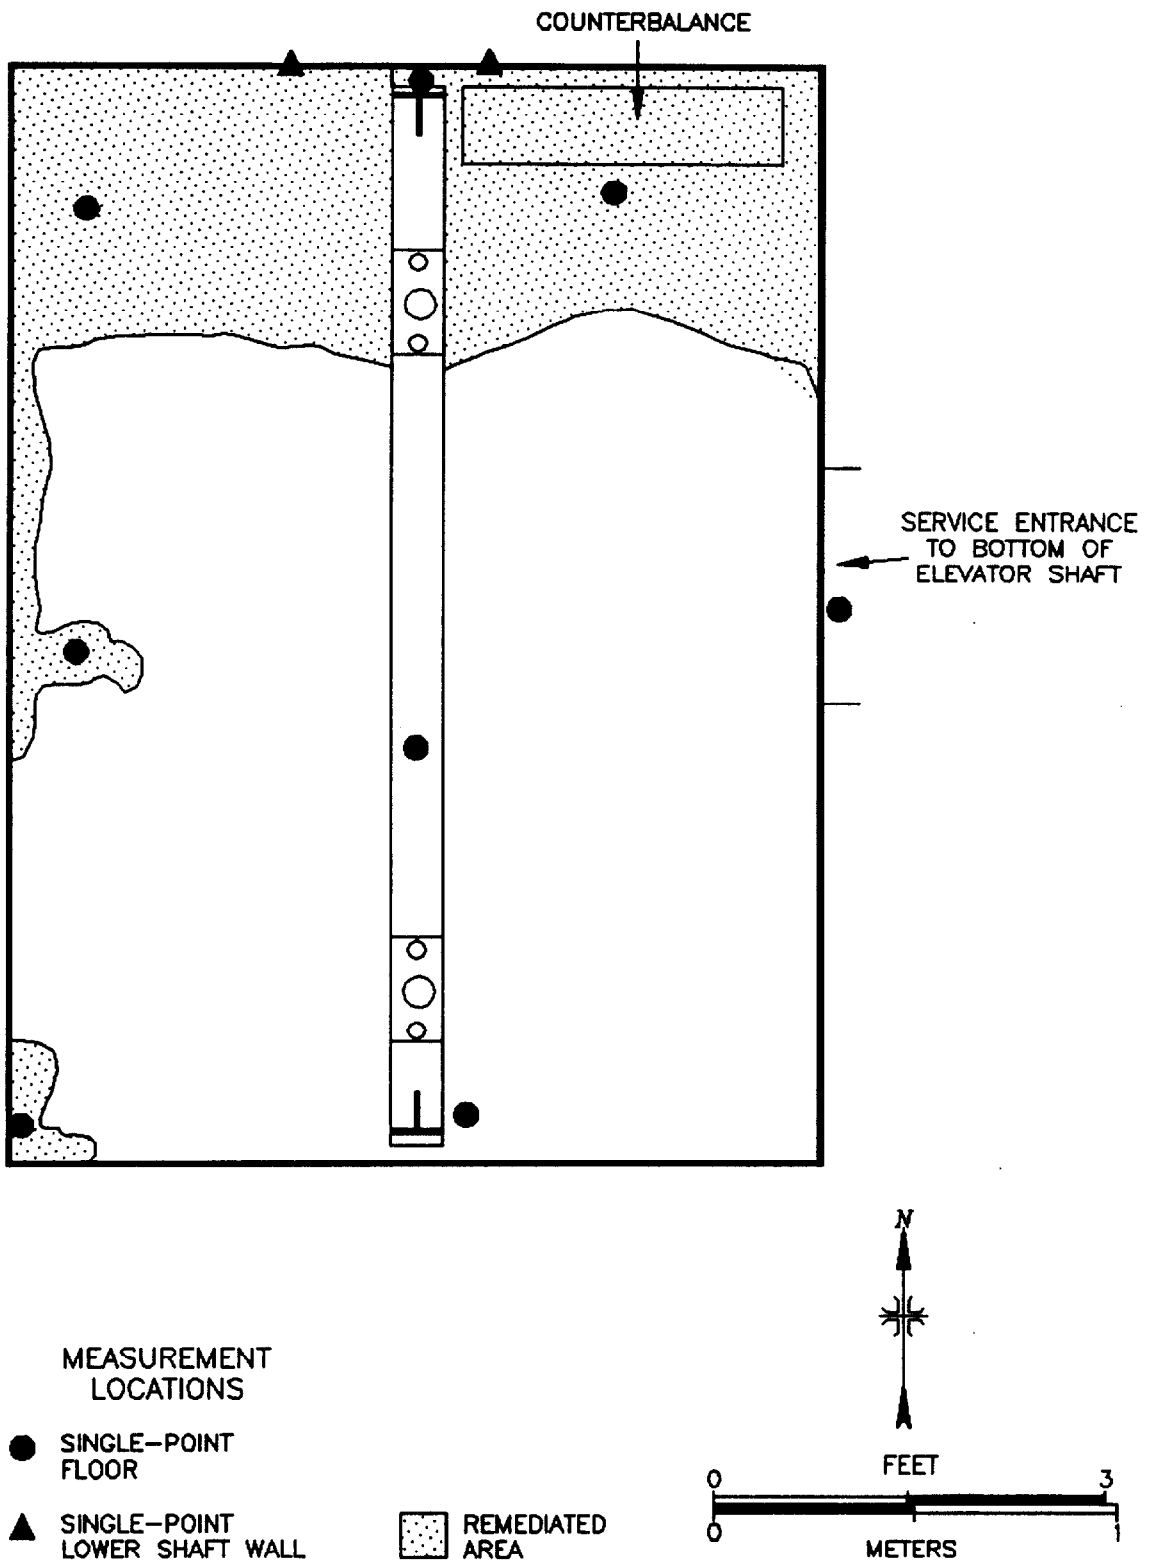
Building 23, Basement, Southeast Corner Elevator Shaft-Floor and Lower Wall – Remediated Areas and Measurement Locations
